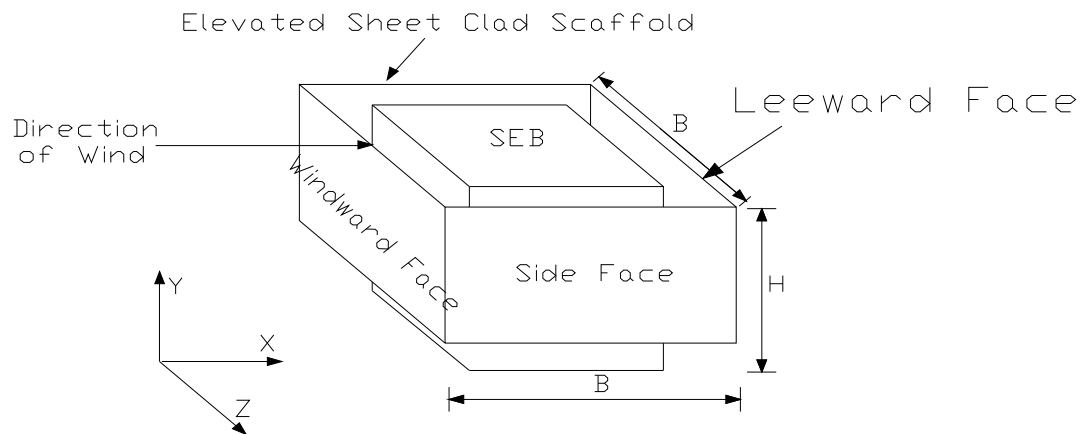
Scaled cubical SEB surrounded by elevated sheet clad scaffold
